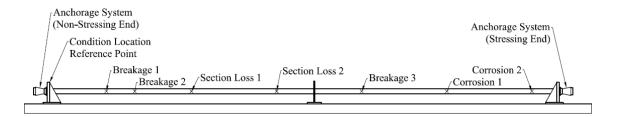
Breakage, Section Loss, and Corrosion Placement
